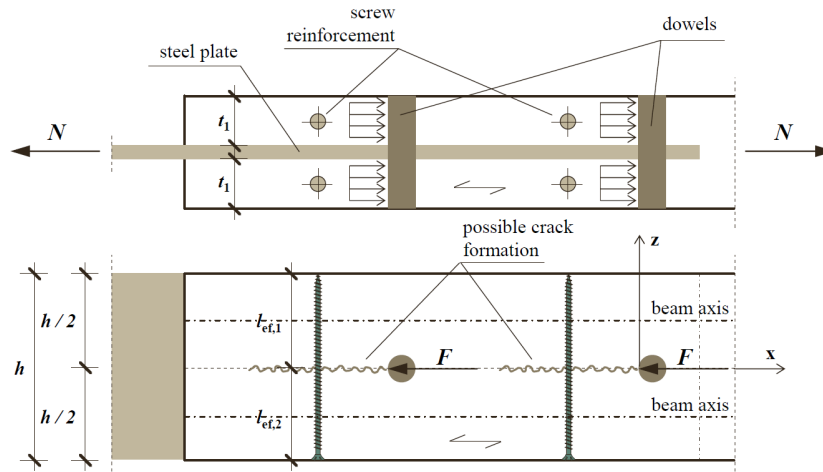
Top view and side view of a dowel type connection by Ringhofer [21].
